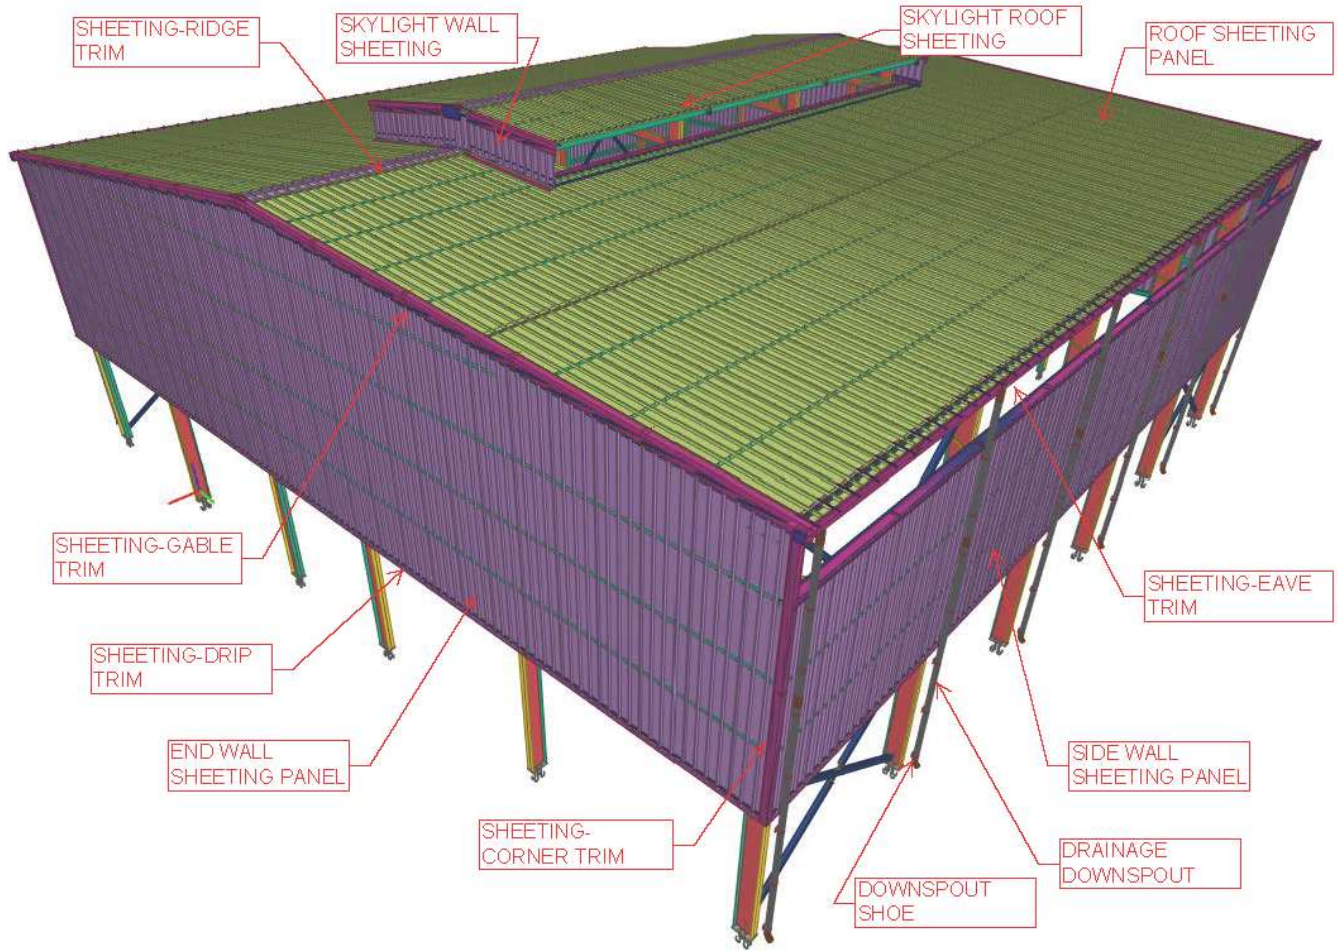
Components of Roof and Wall Sheeting in PEB Building
